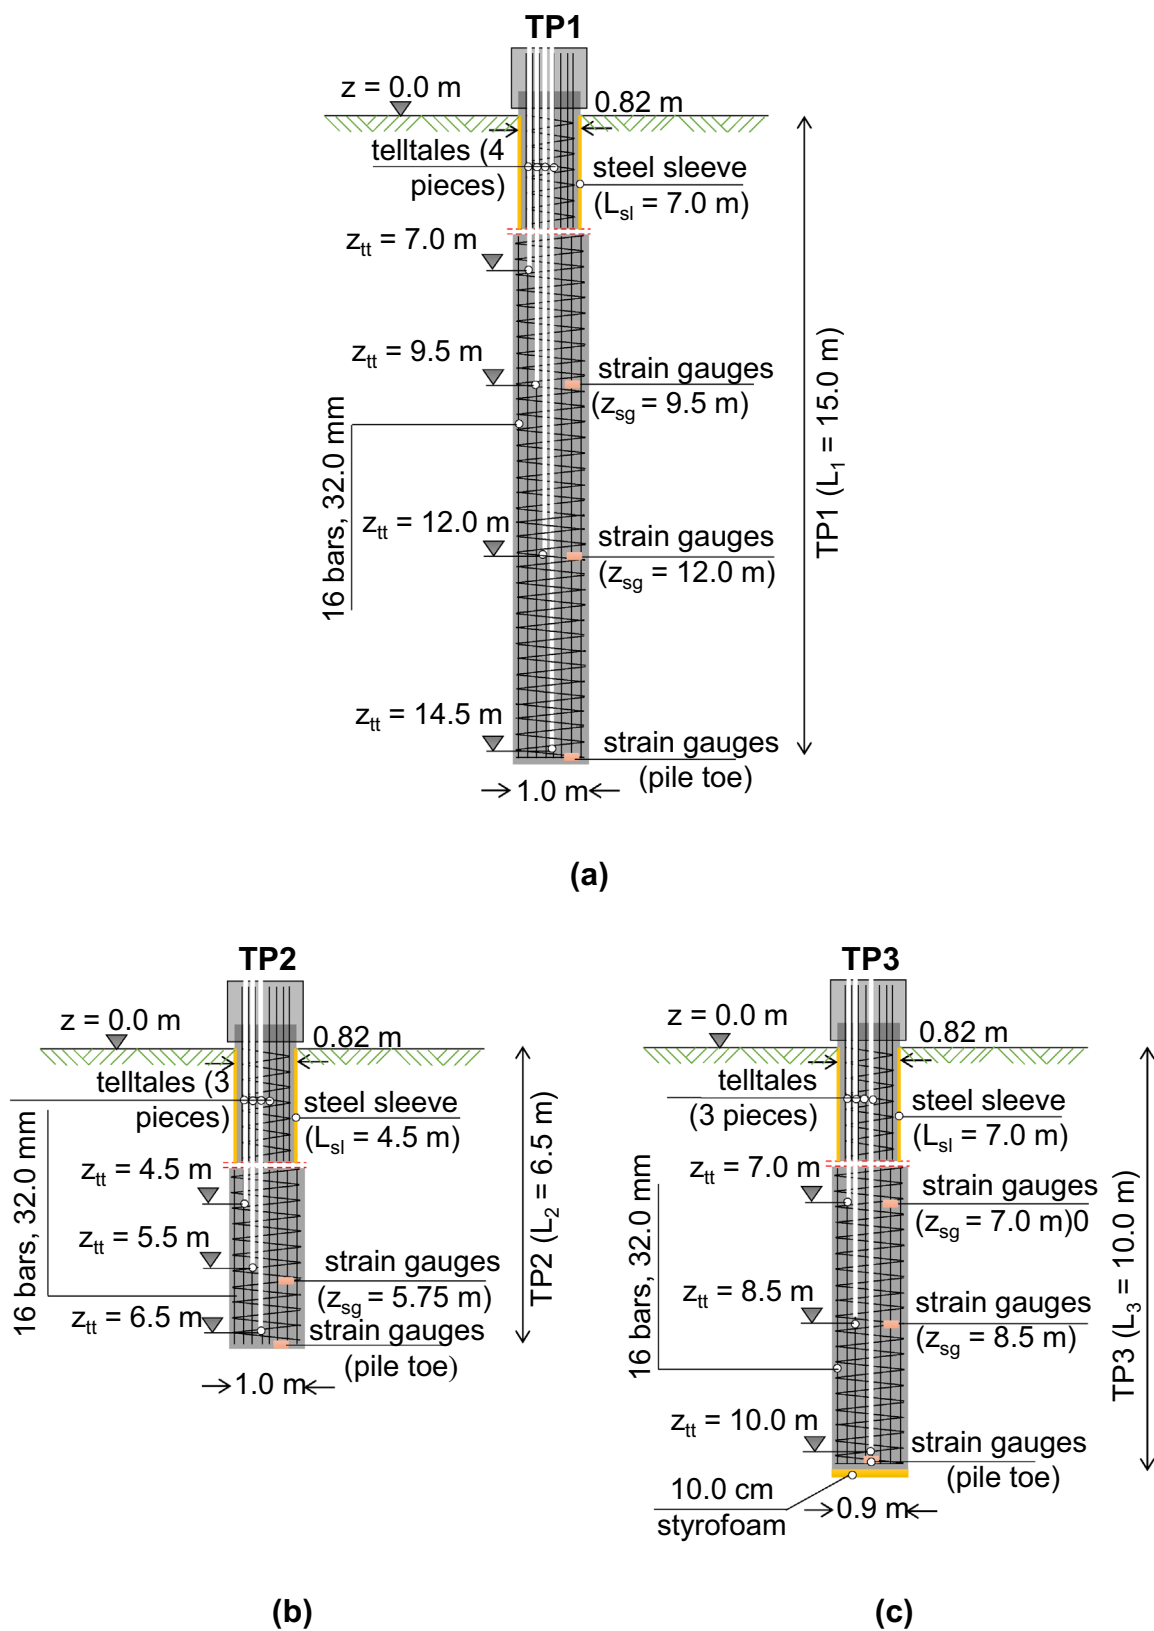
Details of a static pile load test: a Test pile 1; b Test pile 2; c Test pile 3
